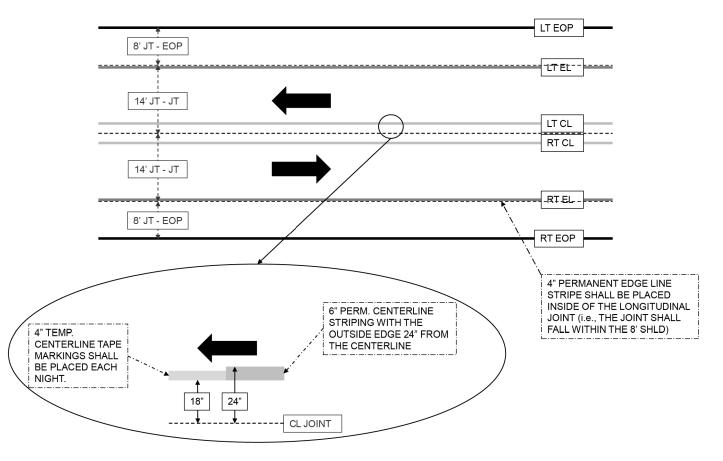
TYPICAL JOINT-PAVEMENT MARKING CONFIGURATION
